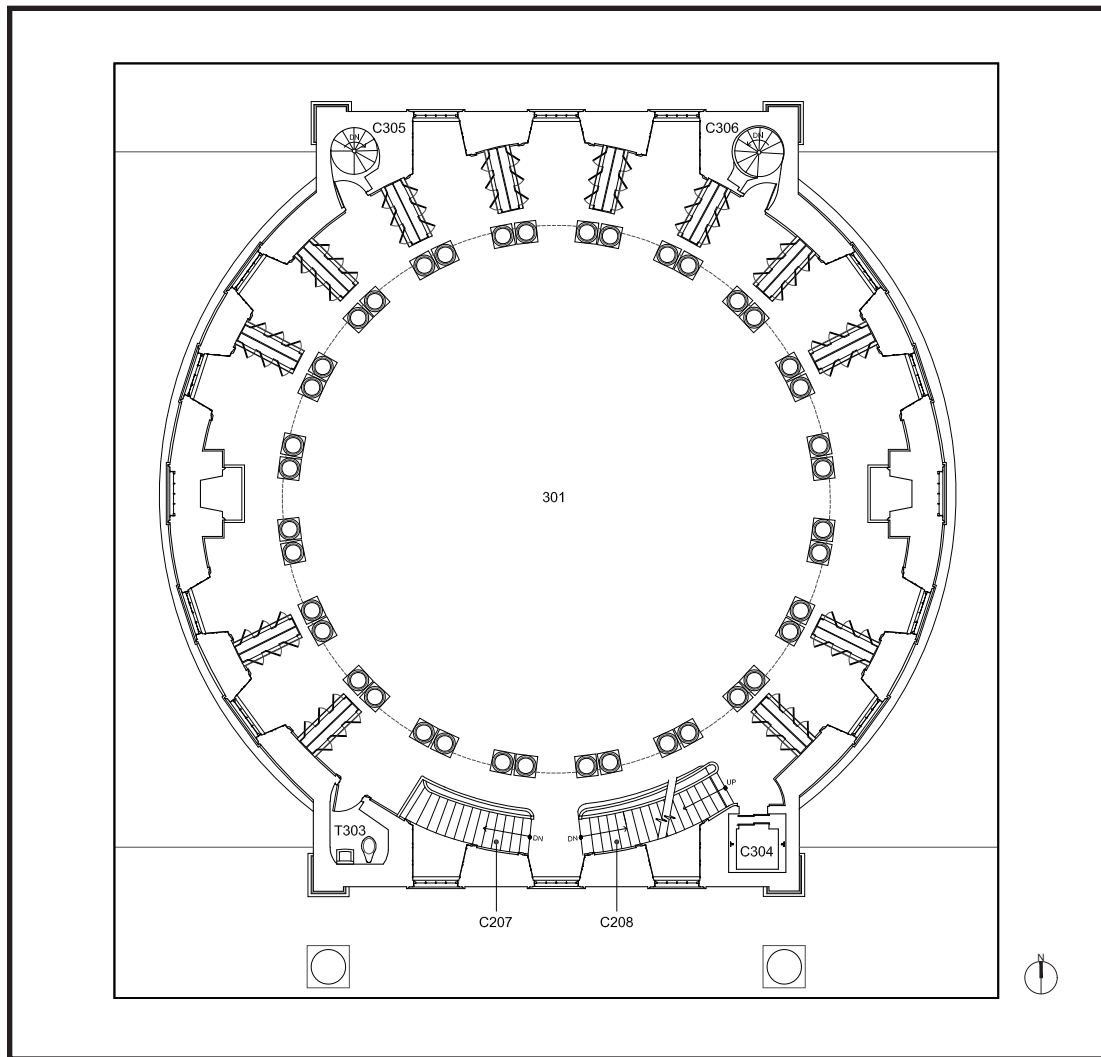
Detail, Dome Room plan (not to scale).
